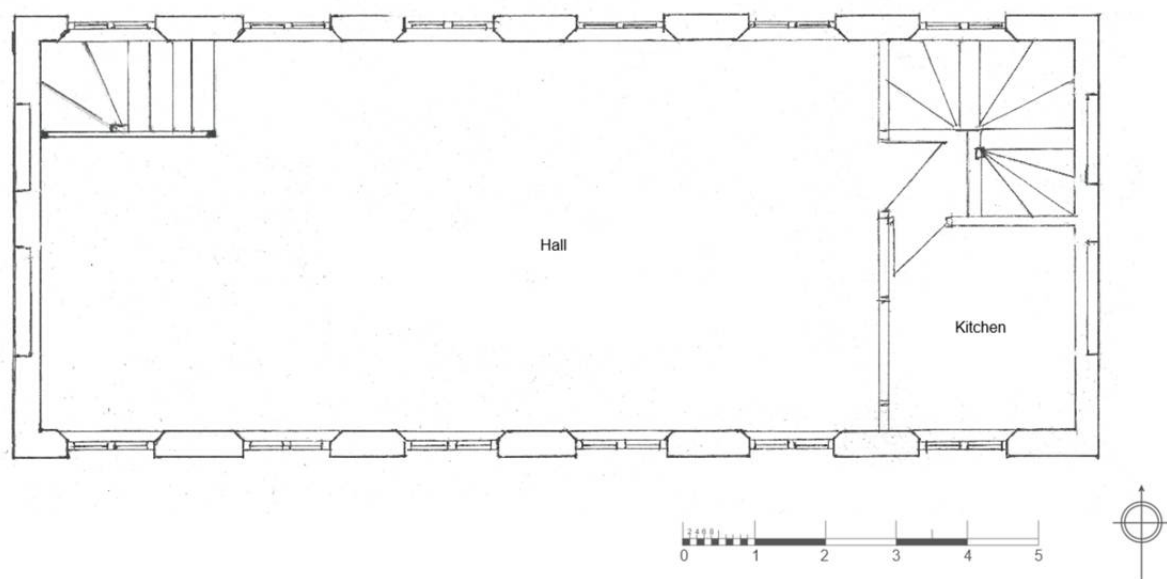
Floor Plan of the second floor showing casement windows to each side of the hall, the position of staircases and the kitchen access. It also shows the two bricked in ghost windows at the east and west end of the building although there is no sign of this internally.
